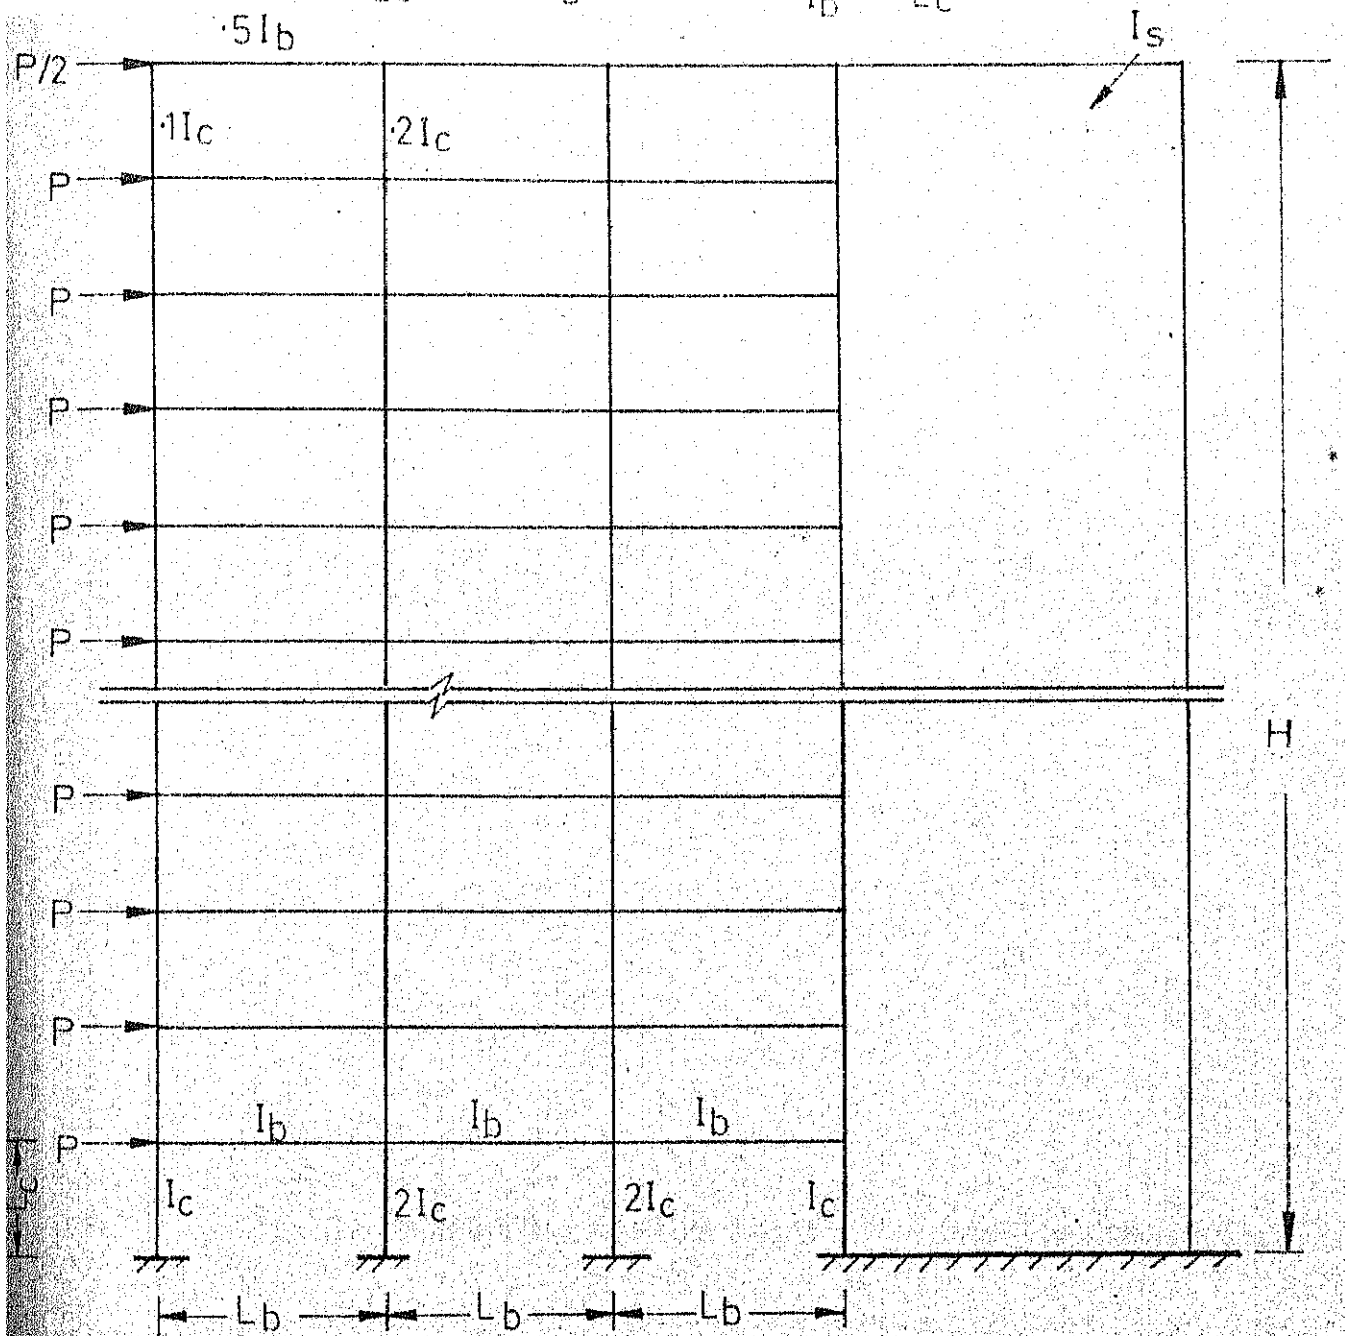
20 STOREY SHEAR WALL-FRAME STRUCTURE
